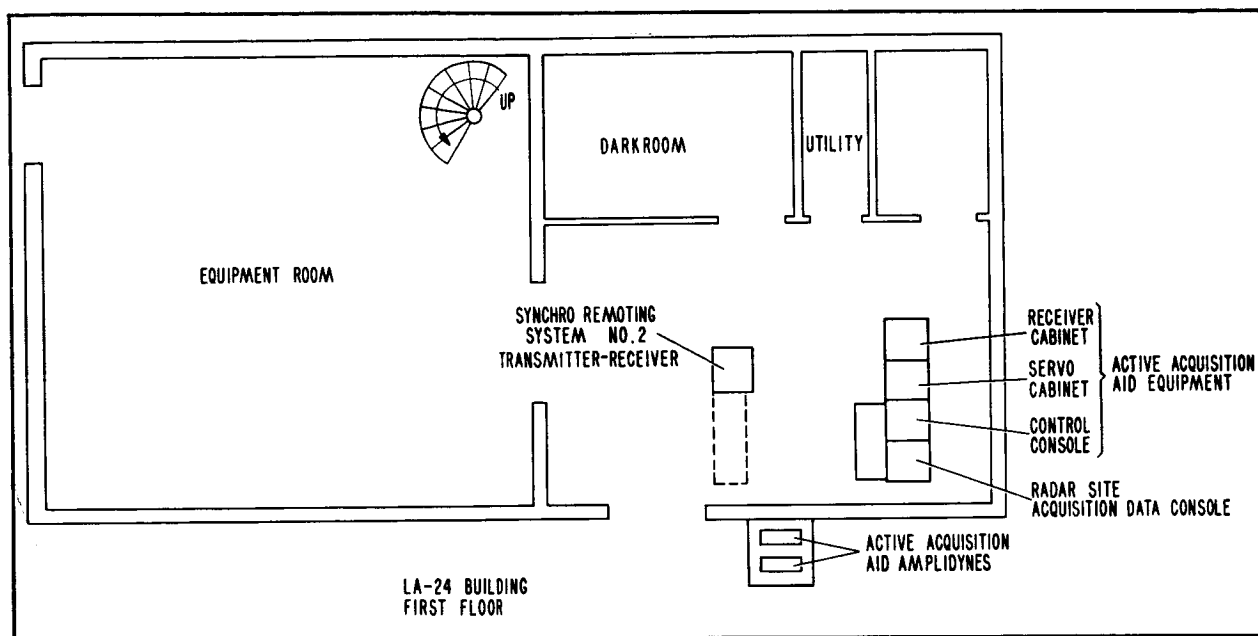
Acquisition System Equipment Layout, Radar Site LA-24 Building
